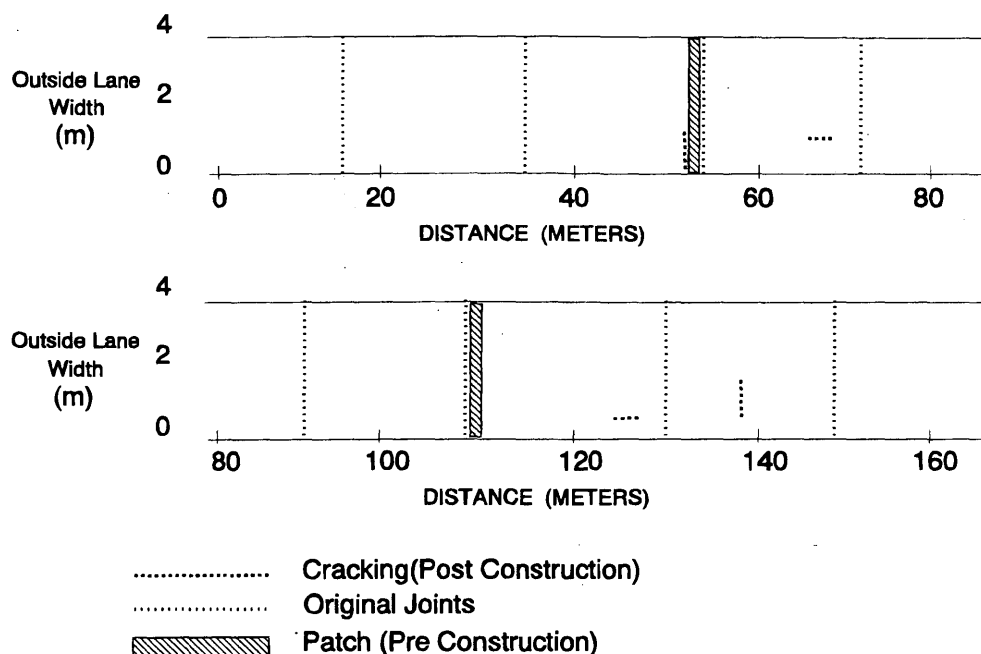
Distress summary for test section 400607 [0.1 m (4 in.) rubblized with drain].
